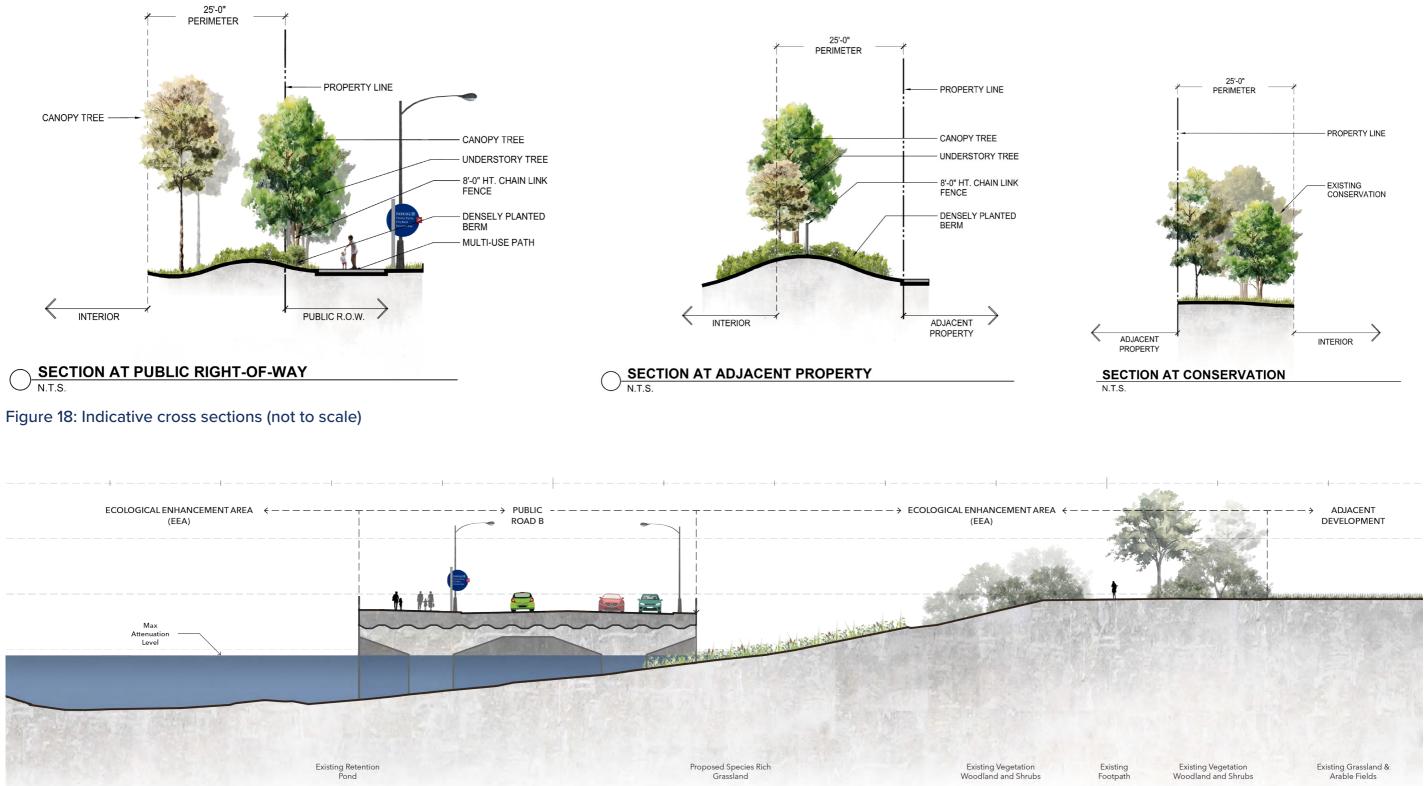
Indicative cross section through proposed public road and Ecological Enhancement Area (not to scale)
